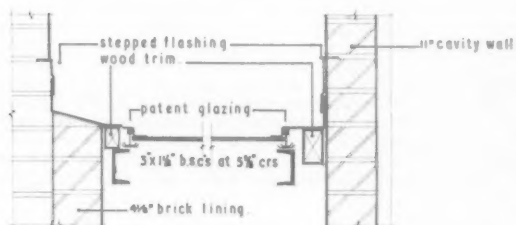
DETAILS OF NORTH LIGHT ROOF Scale: 1"=1ft.
